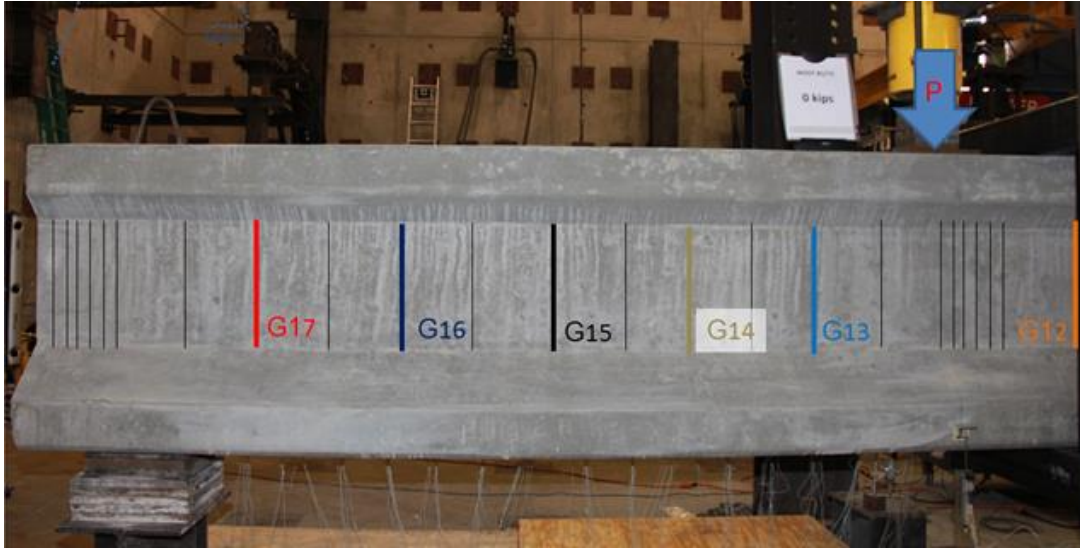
Girder 1- Test 2 stirrups strain gauges locations
